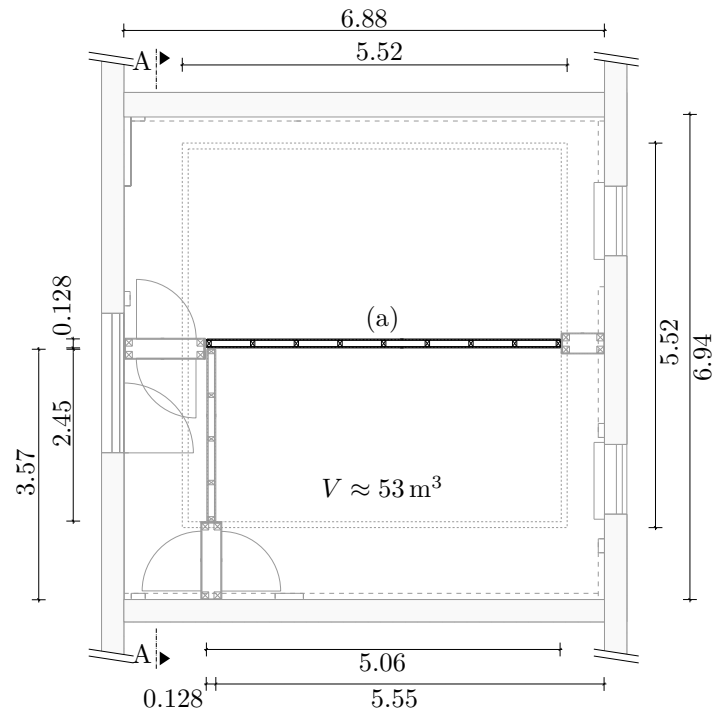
Floor plan of basement (dimensions in metres). Dark lines indicate the test structure.
